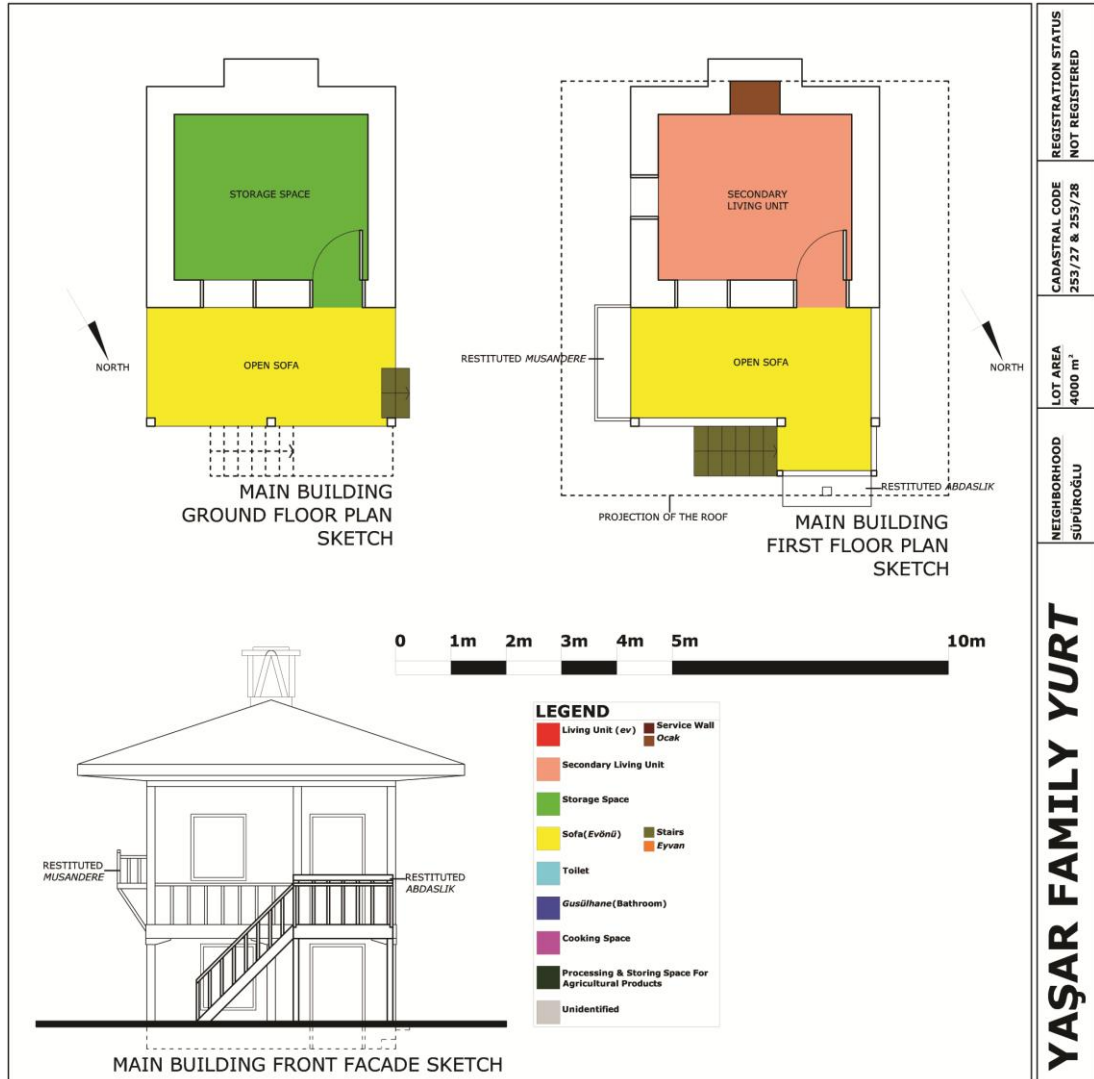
Plan and front façade sketches of the traditional building in the yurt of Yaşar Family
